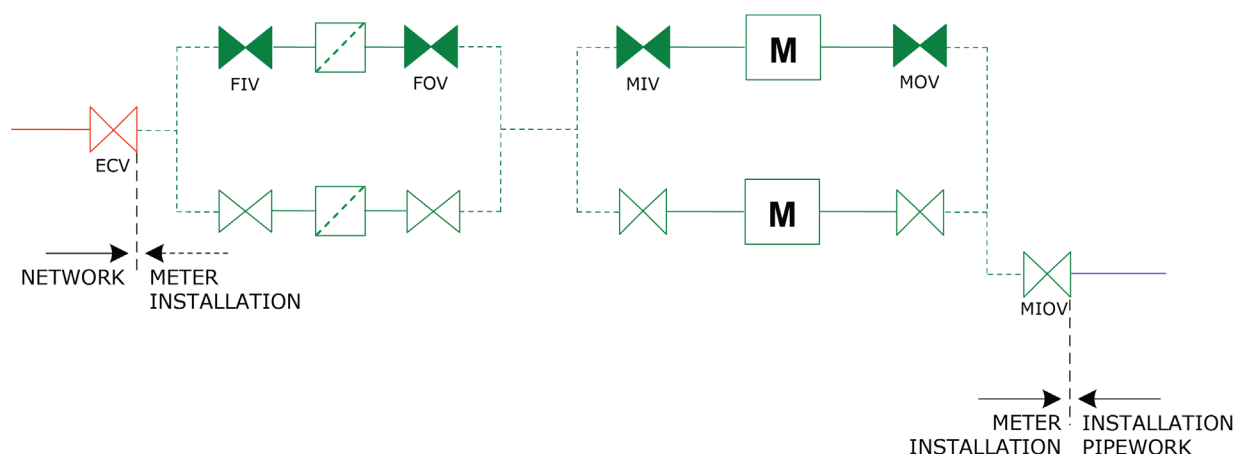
STANDARD ARRANGEMENT TYPICAL INSTALLATION SUPPLY MOP > 7bar
